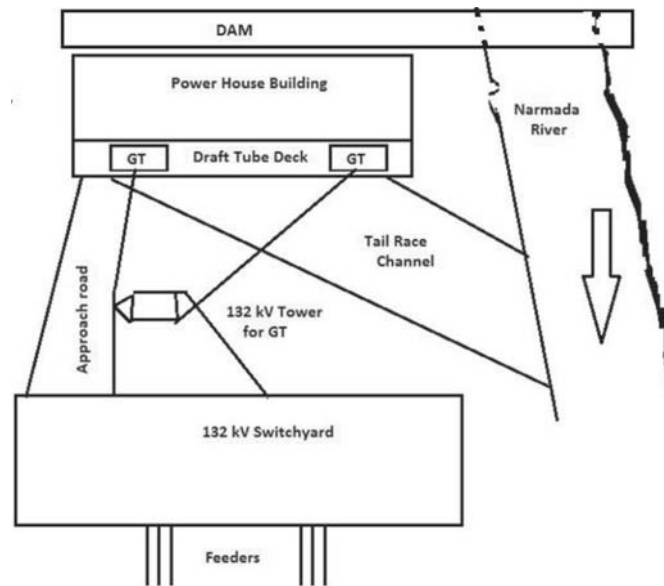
Relative positions of power house building, G.T., and Switch yard of Bargi HPP
